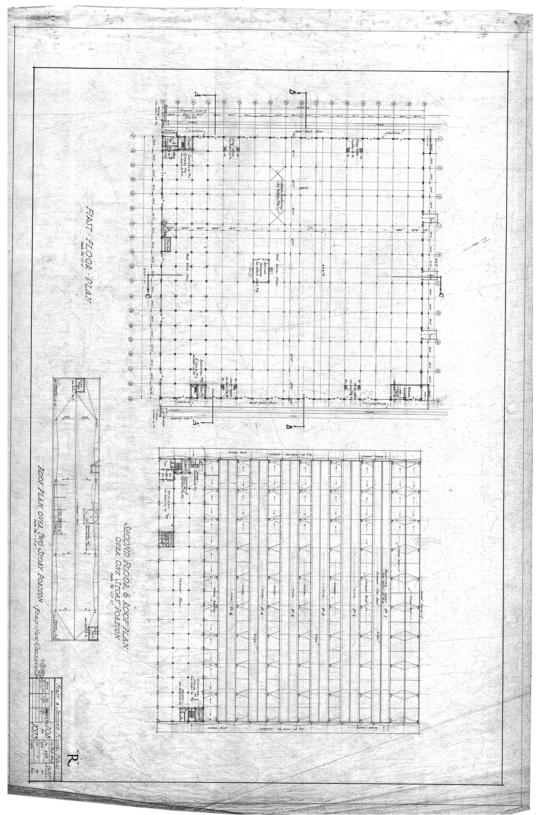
1st floor and 2nd floor/roof plans, Albert Kahn Associates, 1922. Courtesy of Albert Kahn Associates, 7430 Second Avenue, Detroit, MI, 48202-2798, albertkahn.com.
